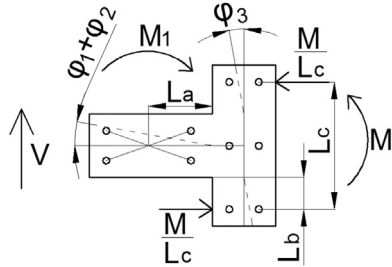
The scheme for the rotation calculation of the gusset plate.
